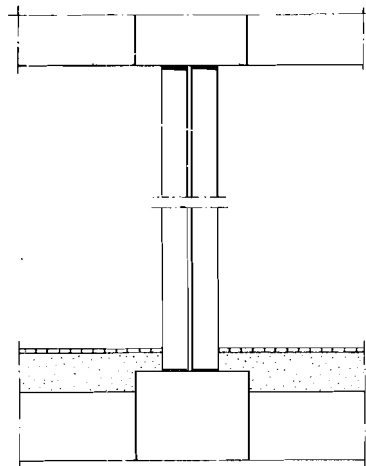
Party wall formed of a double concrete element. It rests on rubber and can also stand on any part of the floor. The element is jointed with rubber concrete on the top and in between. The distance between the floor surface and the underfloor is sufficient to hold the pipes according to the text. The wall between rooms is made of single elements.
